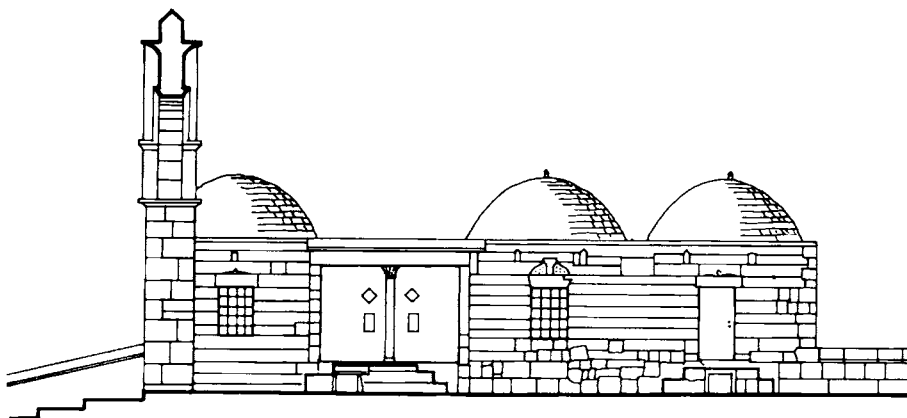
Khalwat Qitas and Khalwat Parwiz, elevation of south façade.
